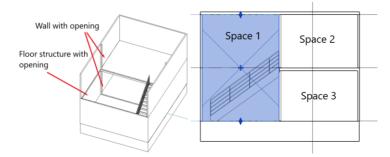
REVIT BIM MODEL – MEZZANINE CASE 27 – LEFT: 3D VIEW. RIGHT: SECTION VIEW
